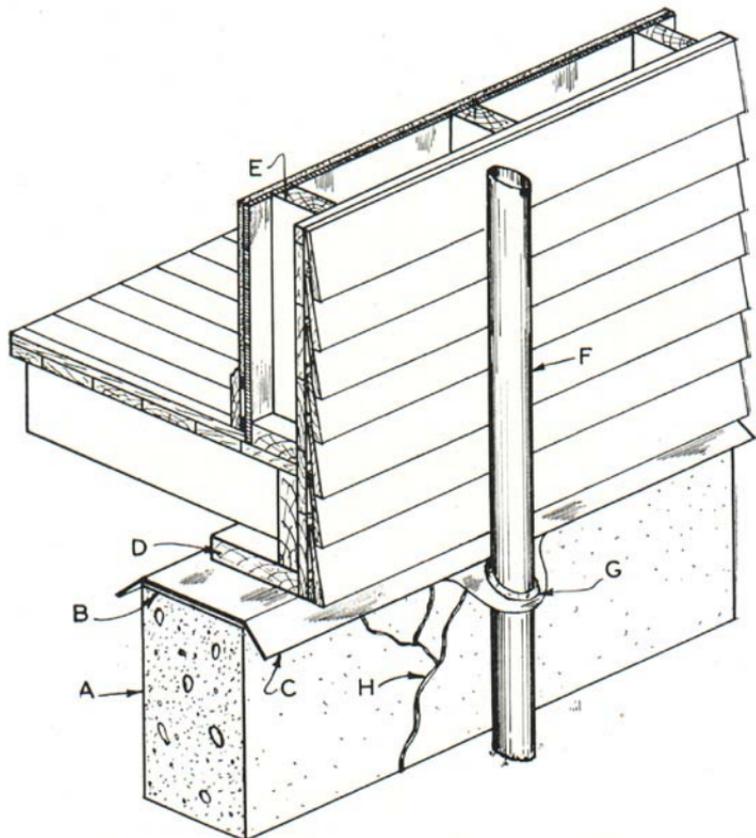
Flashing of foundation wall with corrosion-resistant metal with protected drain pipe in place. a, foundation wall; b, layer of dense concrete sealing foundation wall; c, flashing of corrosion-resistant metal plate; d, sill; e, stud; f, pipe; g, protecting flange which must be fitted to the pipe and to the flashing; h, covered passageway built by termites but checked by flashing.
